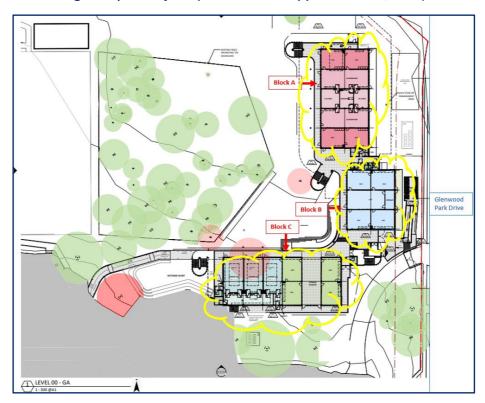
| Building layout – ground level (Base source: Applicant's EIS, 2021)
